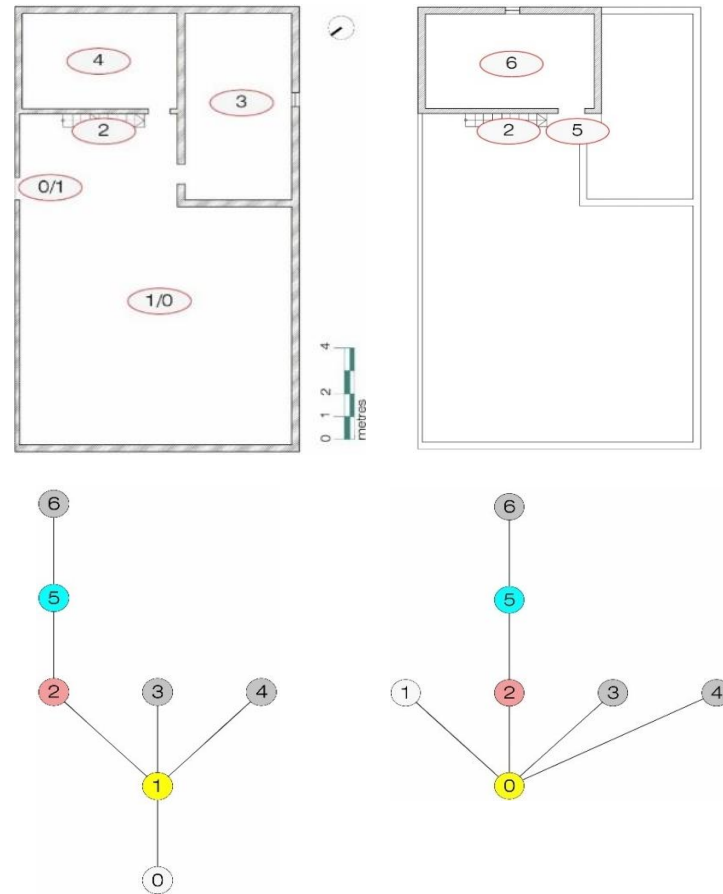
House H10: (top) – (left) ground floor plan, [x/y] refer to movement along the entrance root [x] and the courtyard [y] root, and (right) first floor plan; (bottom) – justified accessibility graph for (left) entrance root and (right) courtyard root
